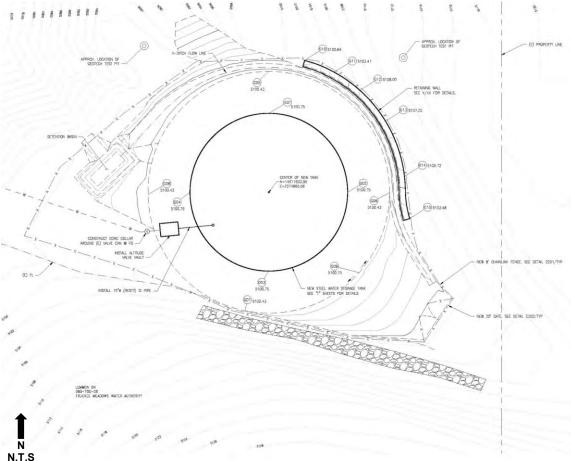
Lemmon Valley Water Tank Replacement Preliminary Site Layout
